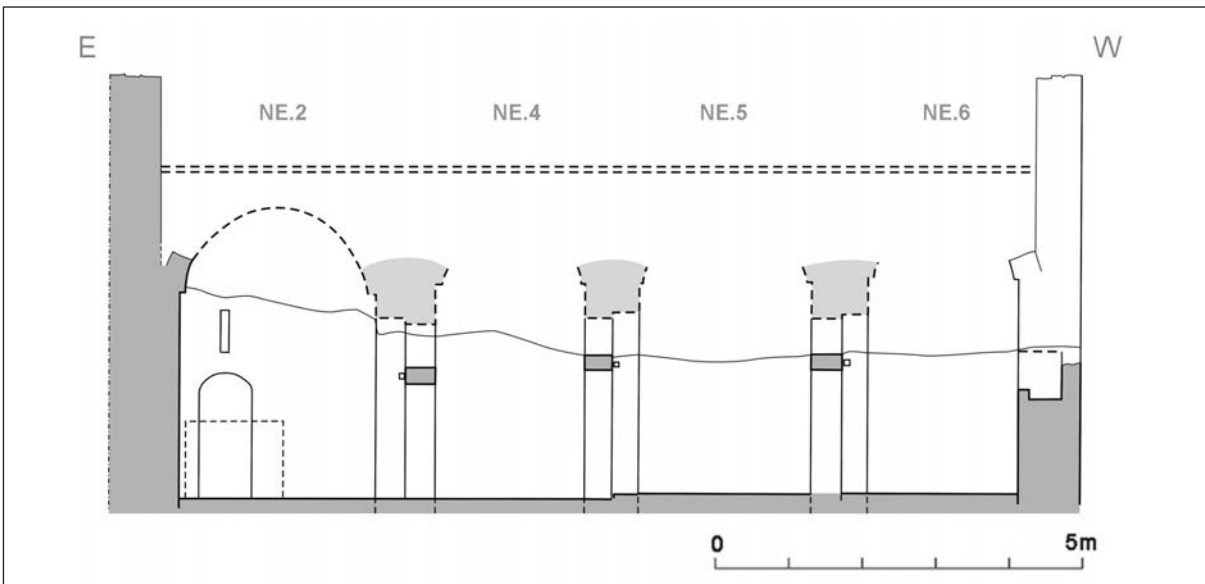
Rooms B.I.NE.2 and 4–6, east–west section looking south (see Fig. 4.3 for plan of the building)
